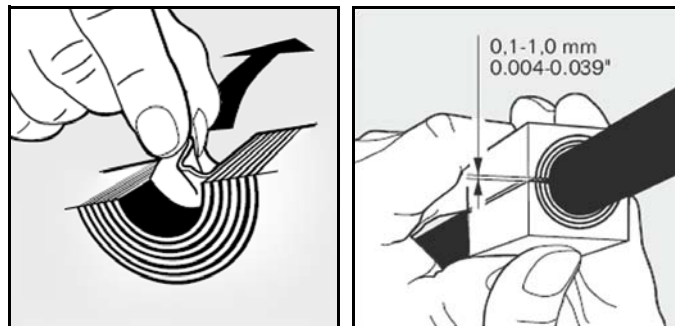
Adapting a Module to the Cable Size, Checking the Gap
